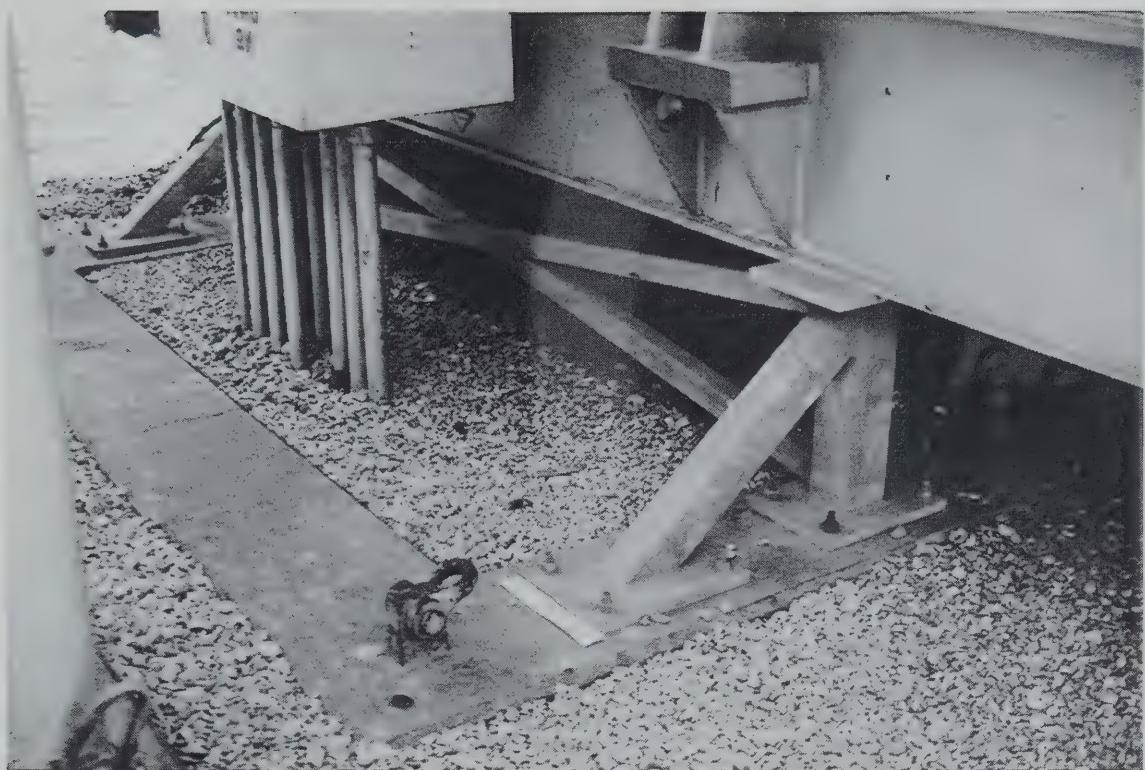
This frame transfers all loads from the transformer to the foundation slab.
